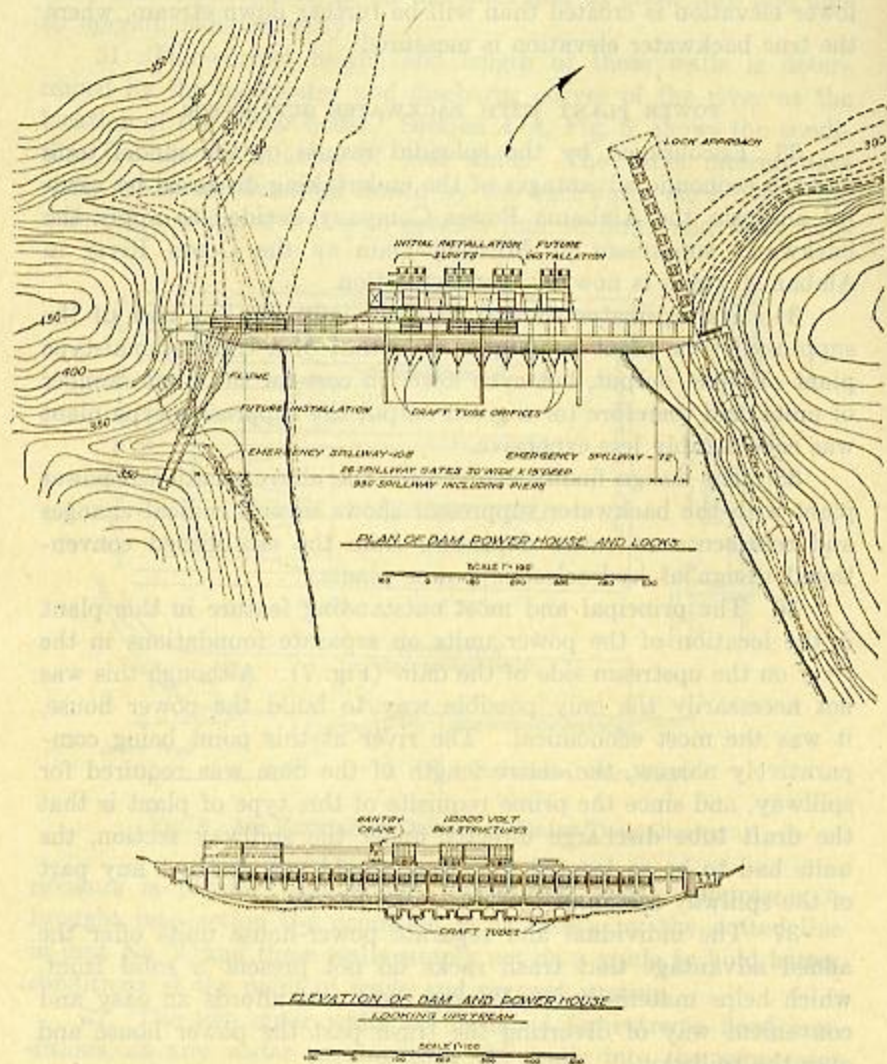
GENERAL PLAN AND ELEVATION OF DAM AND POWER HOUSE
